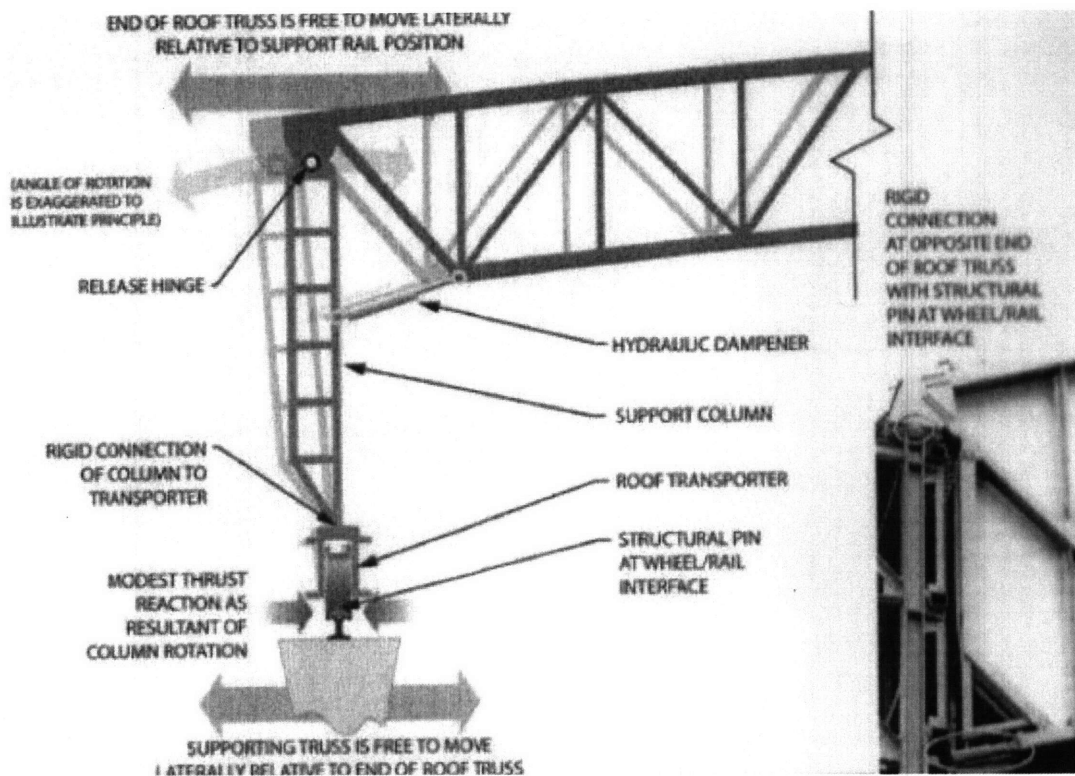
Deflection and forces in Minute Maid Park roof-wall connection [13]
